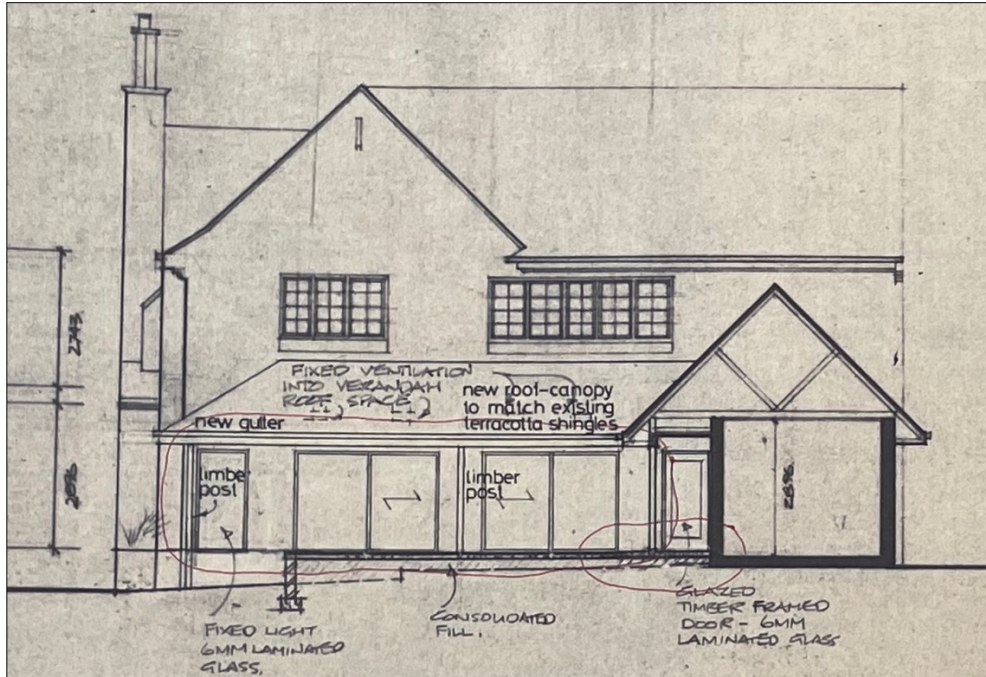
Extract from 1975 drawings by McIntyre McIntyre & Partners showing a new verandah roof and sliding doors to the north elevation Little Milton. Source: Stonington History Centre
